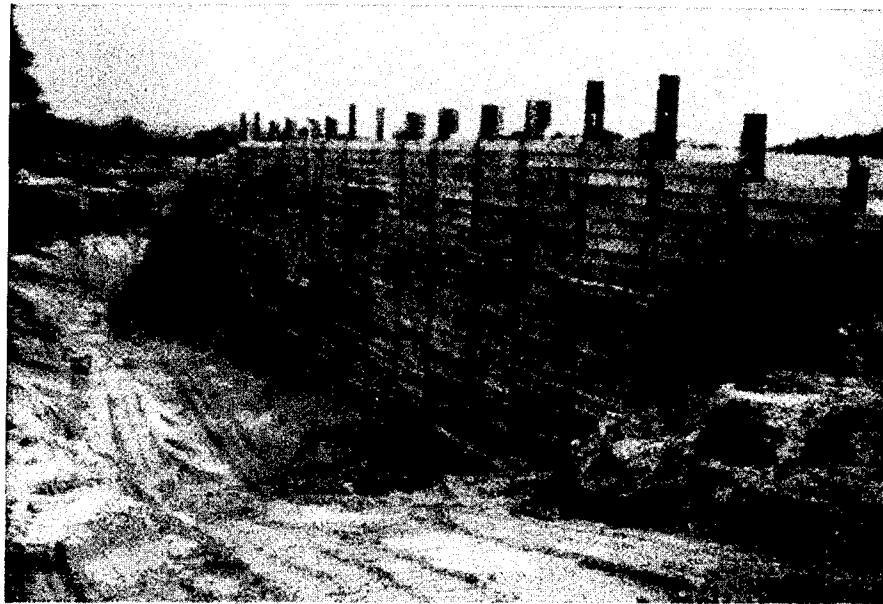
Full-scale ground anchor test wall at TAMU NGES.
